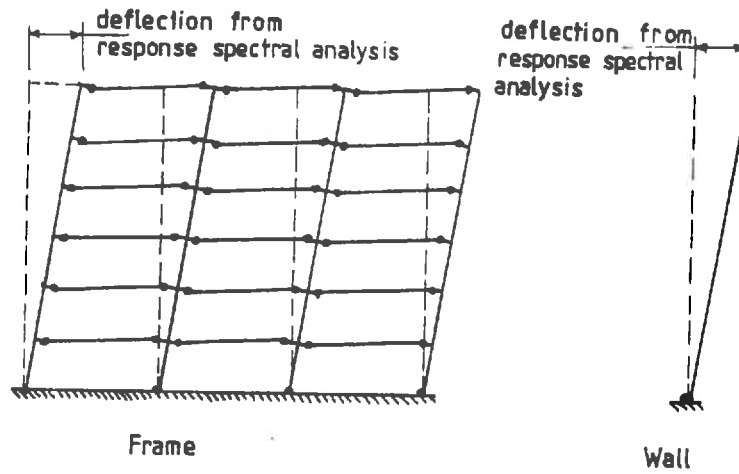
Design Sway Mechanism for Walls and Frames
